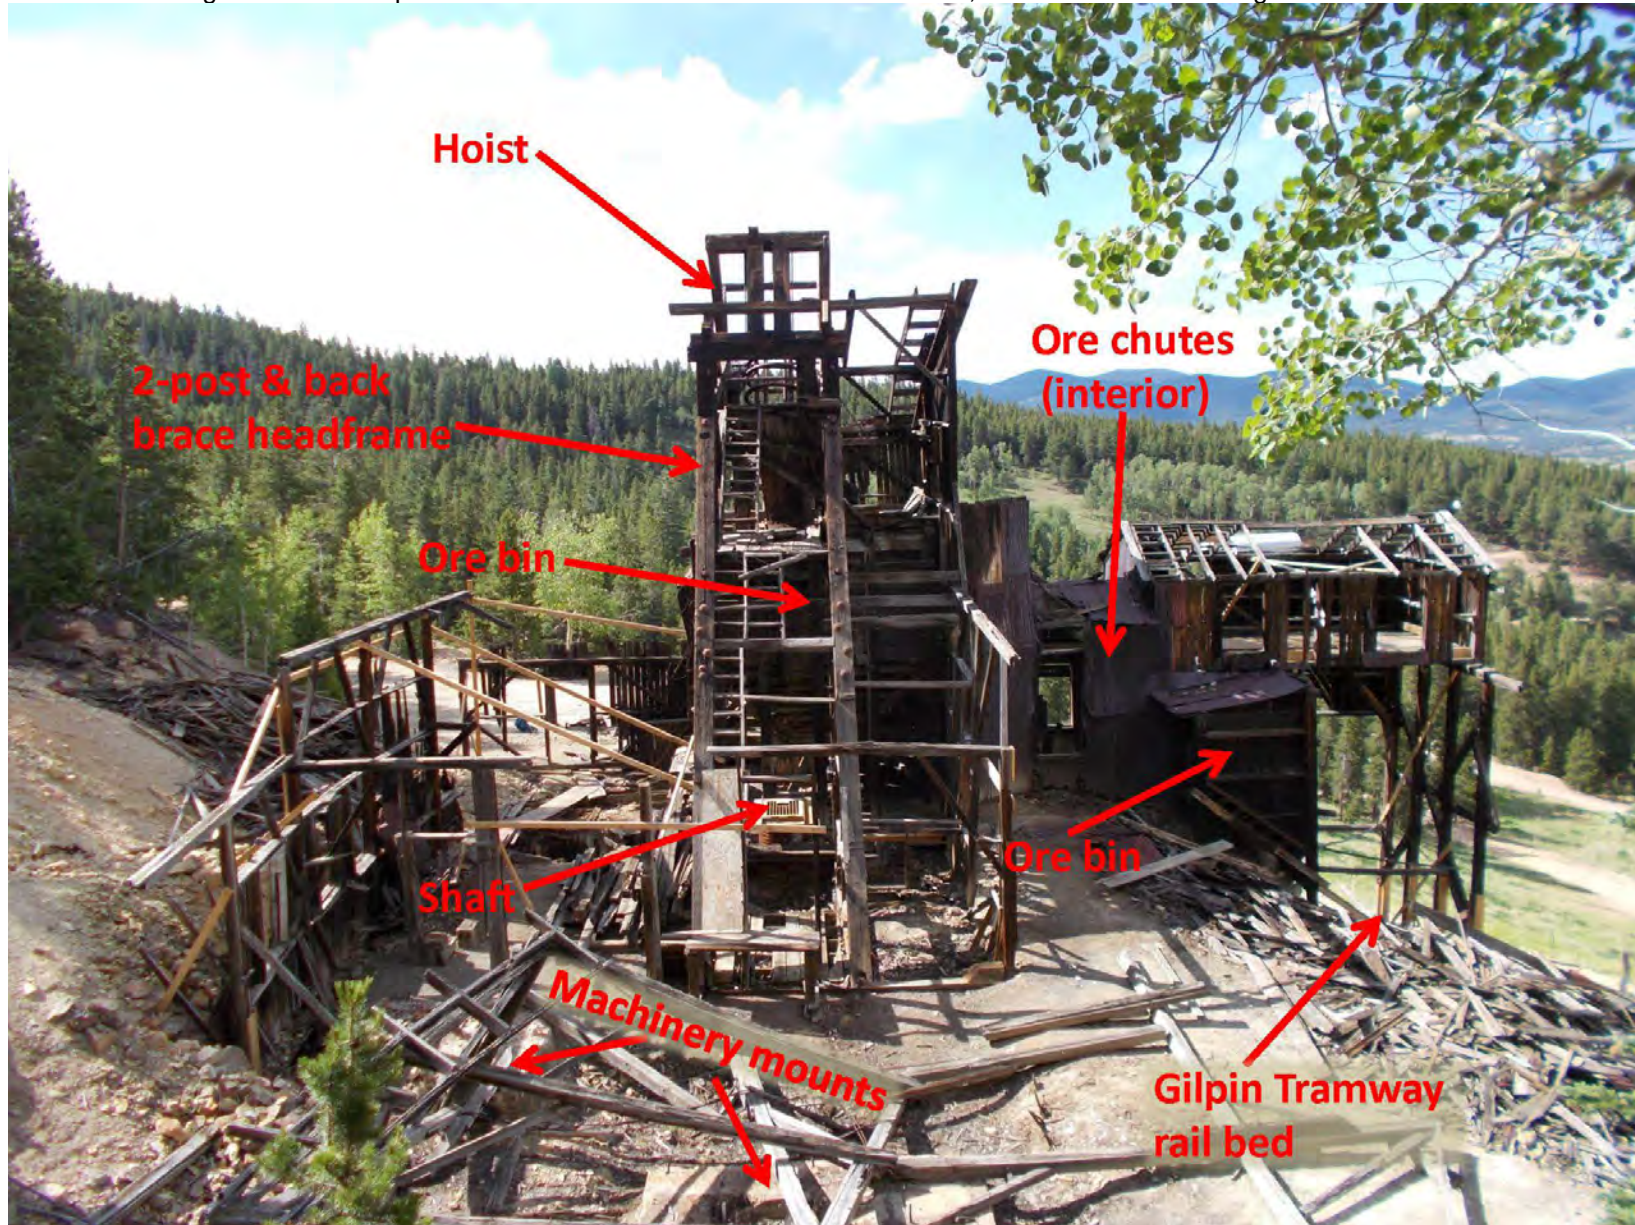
Labeled photo of extant Frontenac Shaft House elements, west side of the building. View northeast.
